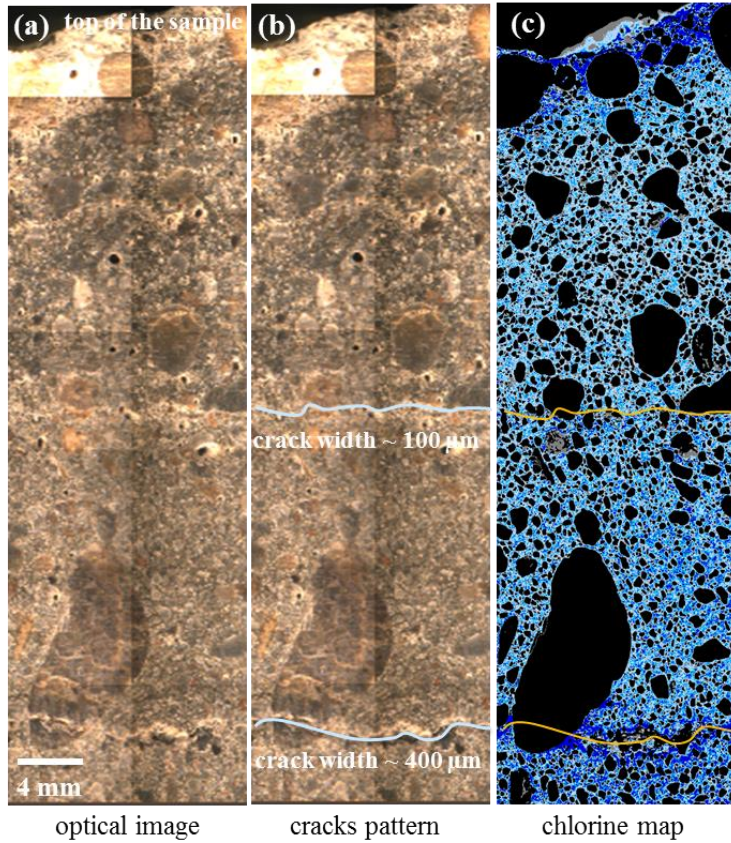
A concrete sample from a bridge deck with horizontal cracks: (a) optical image (b) optical image with cracks highlighted (c) segmented Cl profile map with cracks highlighted.
